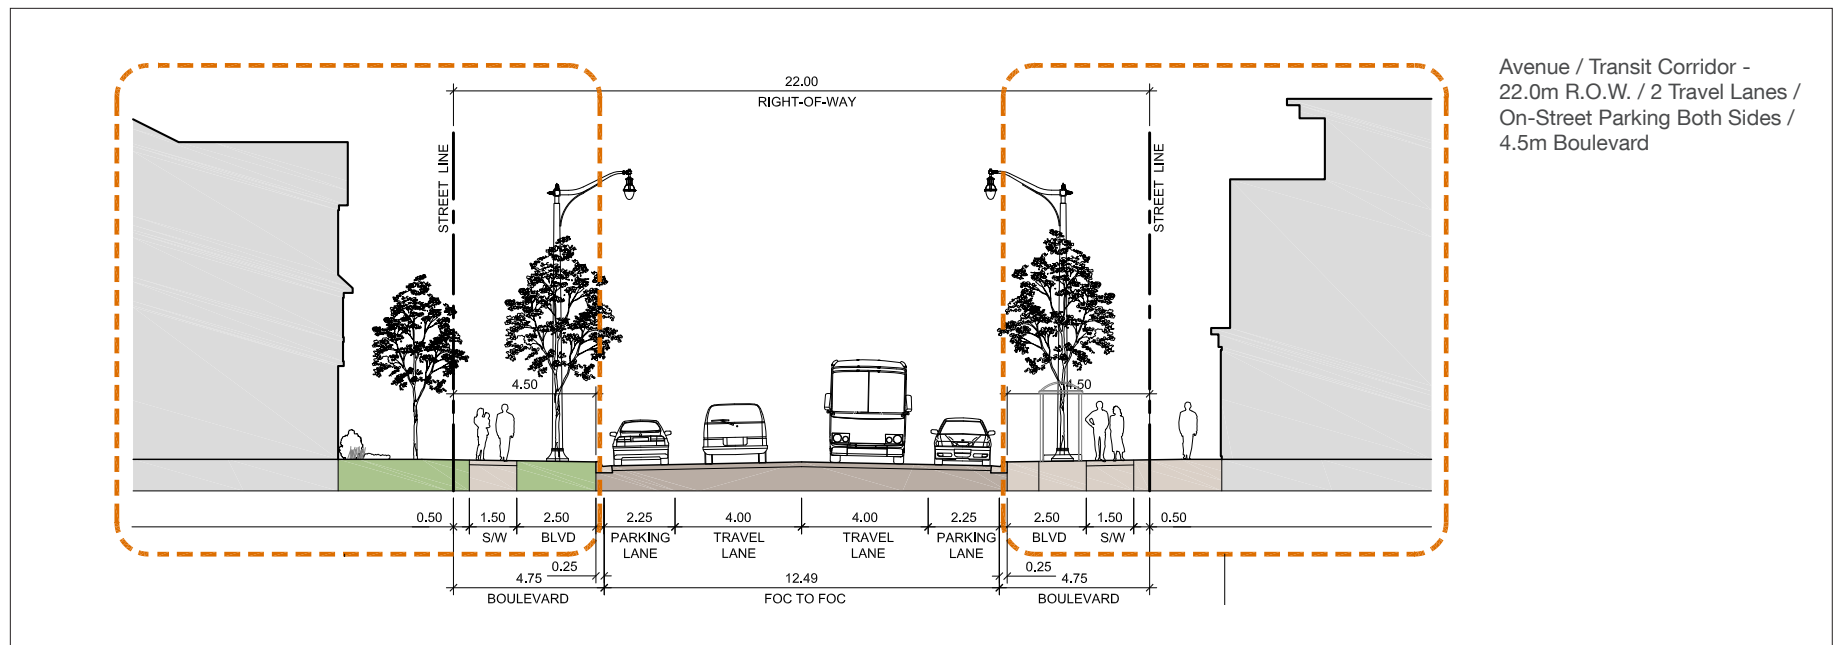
Conceptual cross-section of Neighbourhood Centre Area with building scale and streetscape features that reinforces an active, human-scaled environment
